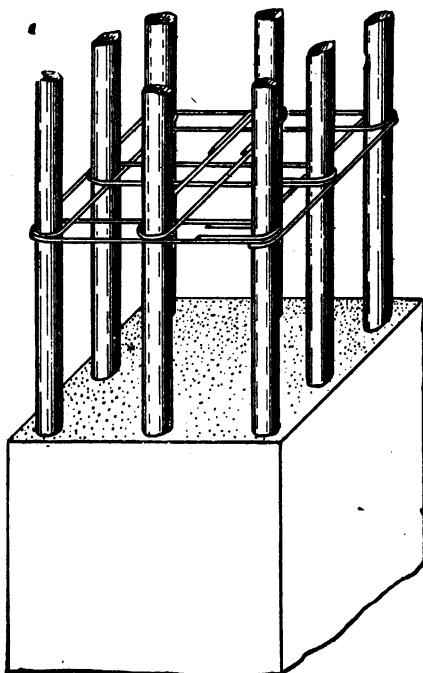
Section of Steel Concrete Column, Hennebique System.
